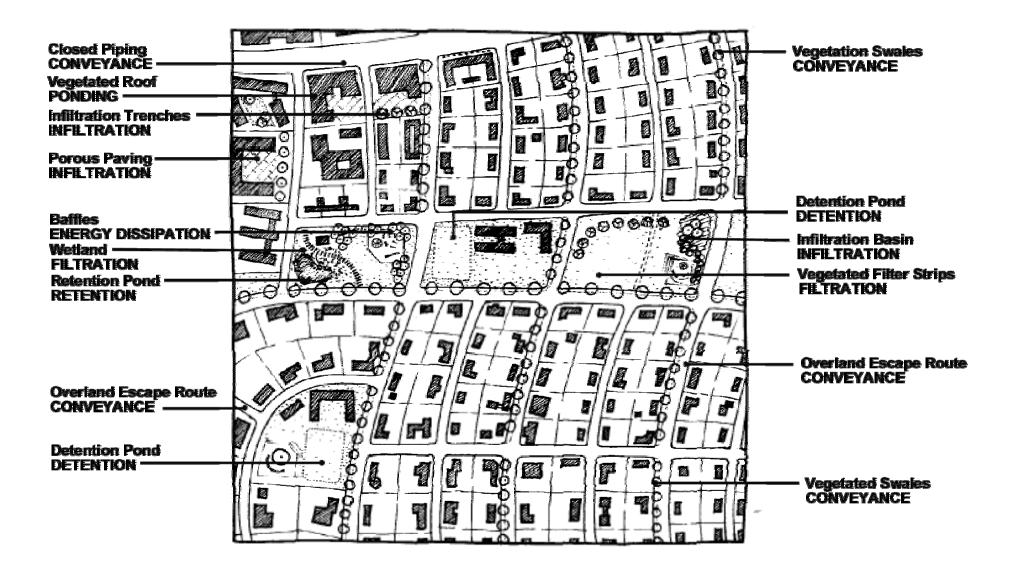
Site B – Site Layout Plan incorporating Conceptual Stormwater Management Plan
